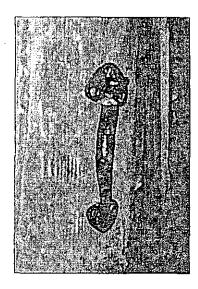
Room 14, bedroom door. Early twentieth century door latch with expanded leaf ends
